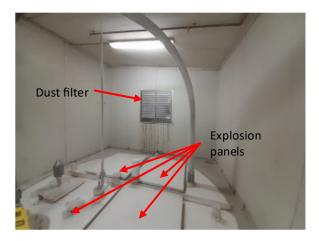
Explosion panels and passive dust filters in explosion panel room above finished product silos.
